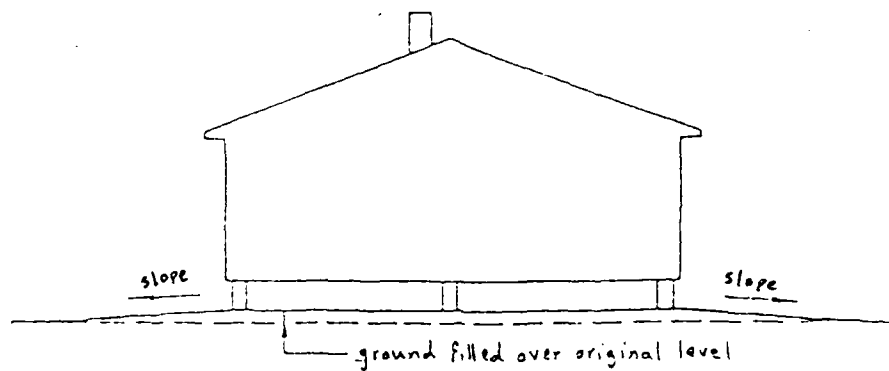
With wet conditions the ground under the house should be raised up to keep it dry. The ground should be graded outside with a slope to lead surface water away.
